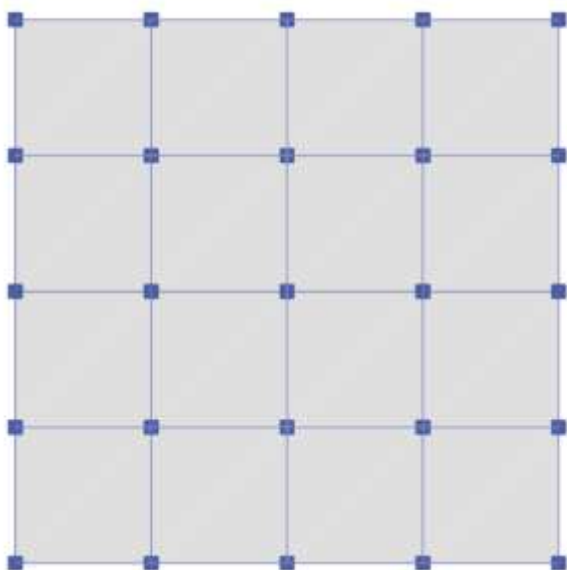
Model IV: 20 storey Building with concrete filled columns at all locations
